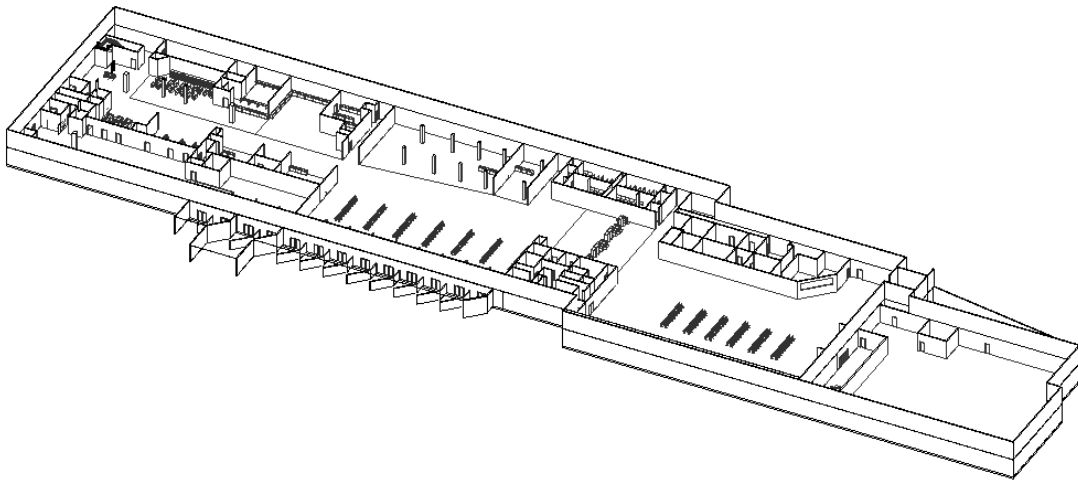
Terminal A 3D Back Interior View (without Roof, Ceilings and Hidden First Floor)
